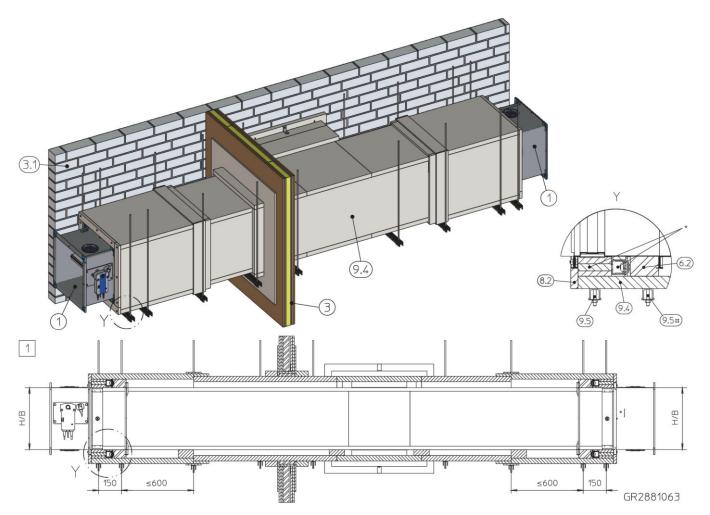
Dry mortarless installation with installation kit WE, remote from a solid wall
